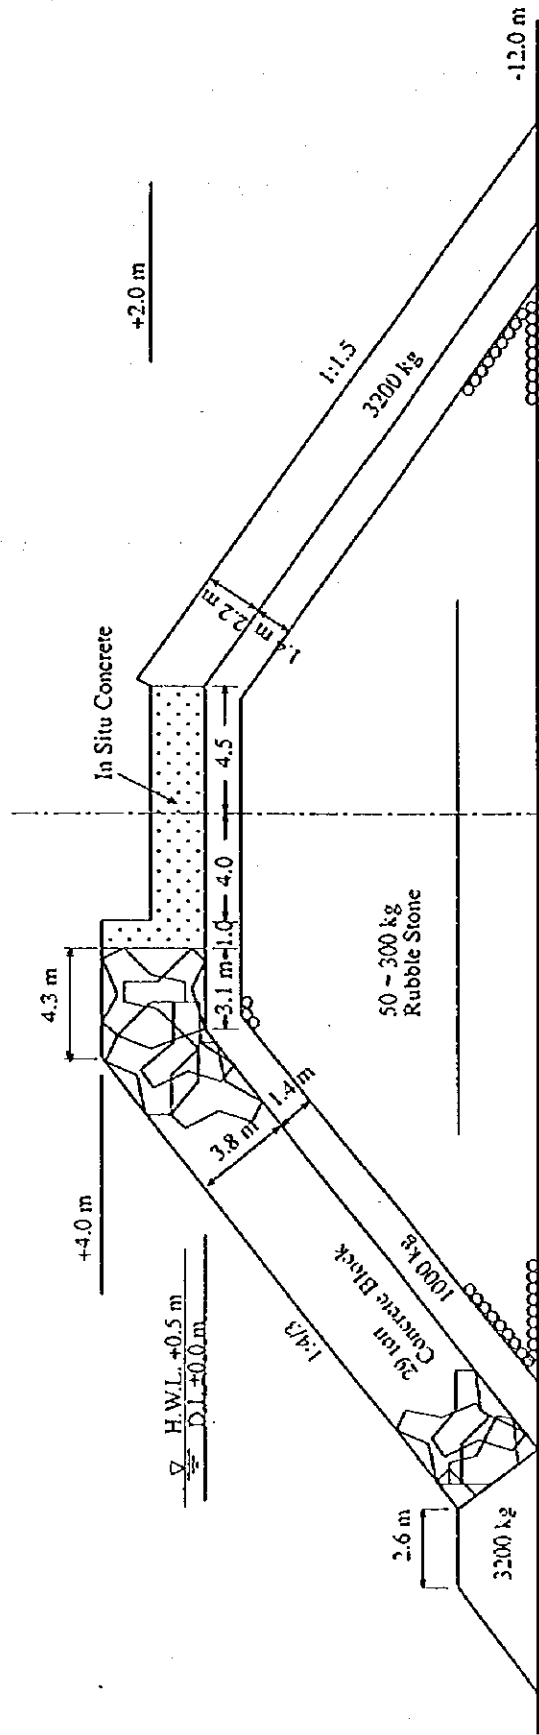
Standard Cross Section of Breakwater
